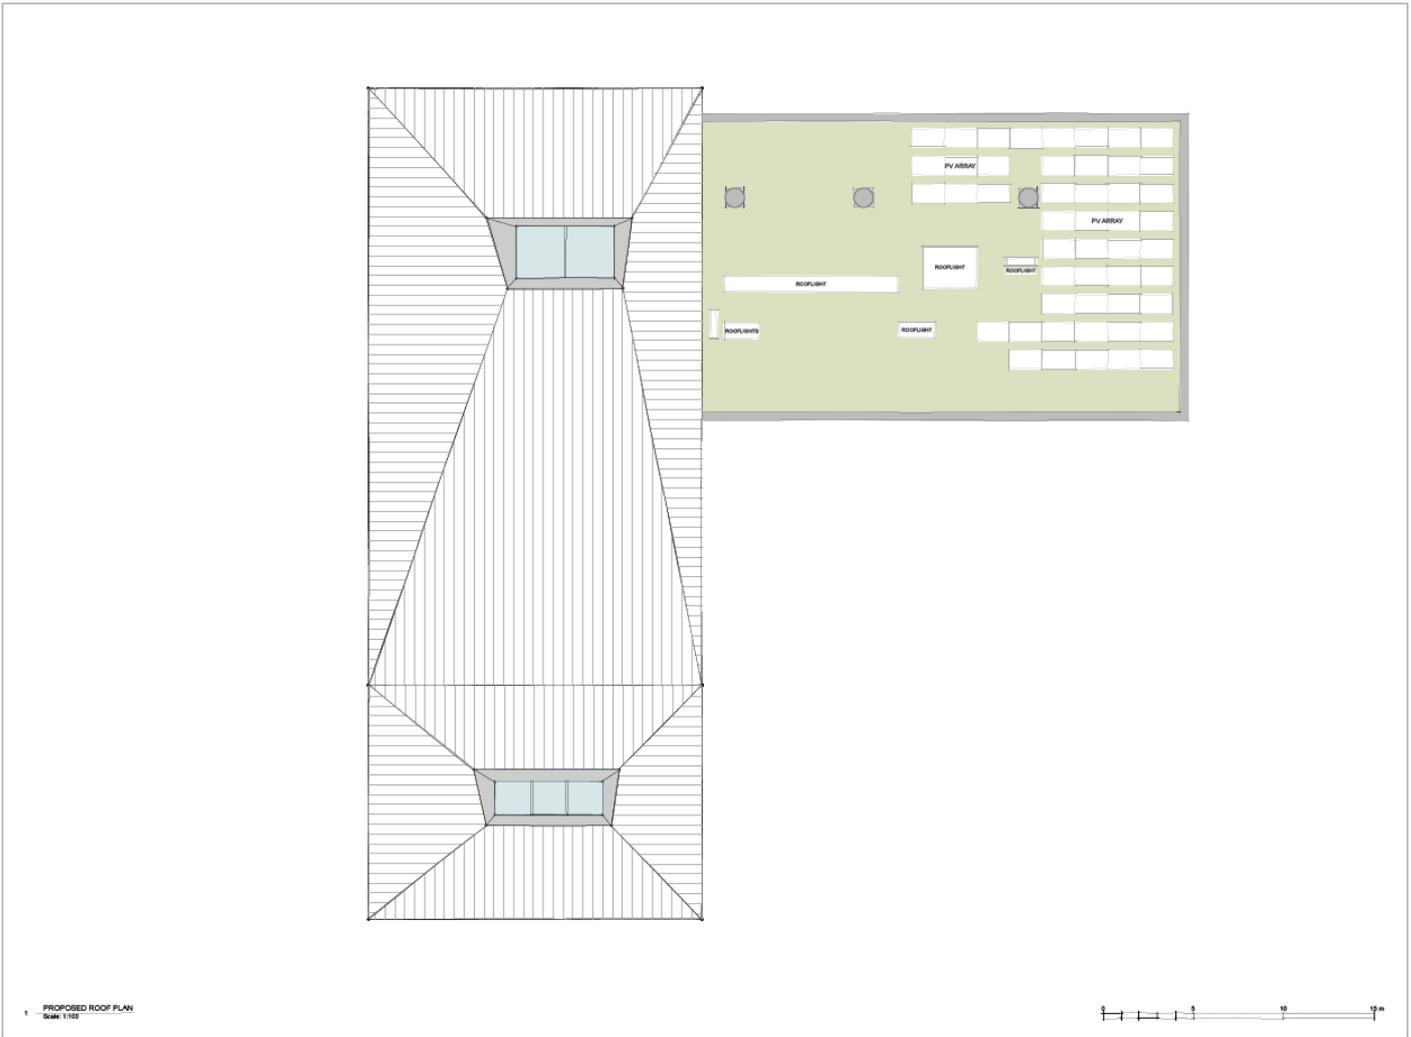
Proposed Roof Plan (drawing ref :323_3_102 dated 18 December 2025)
